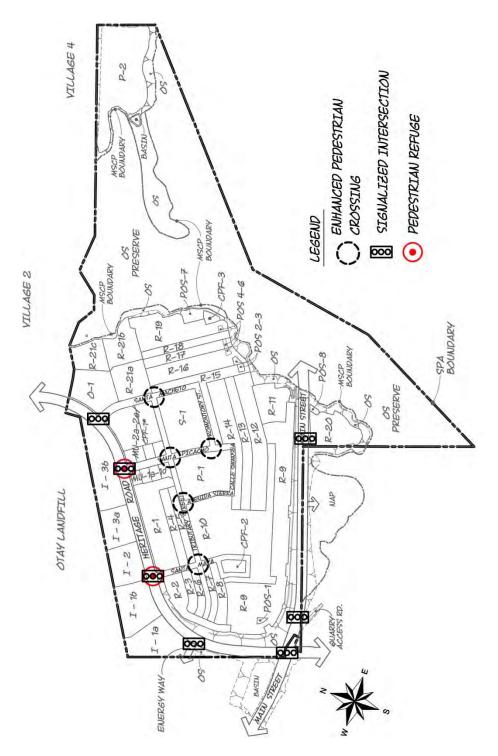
Conceptual Traffic Calming Location Plan
